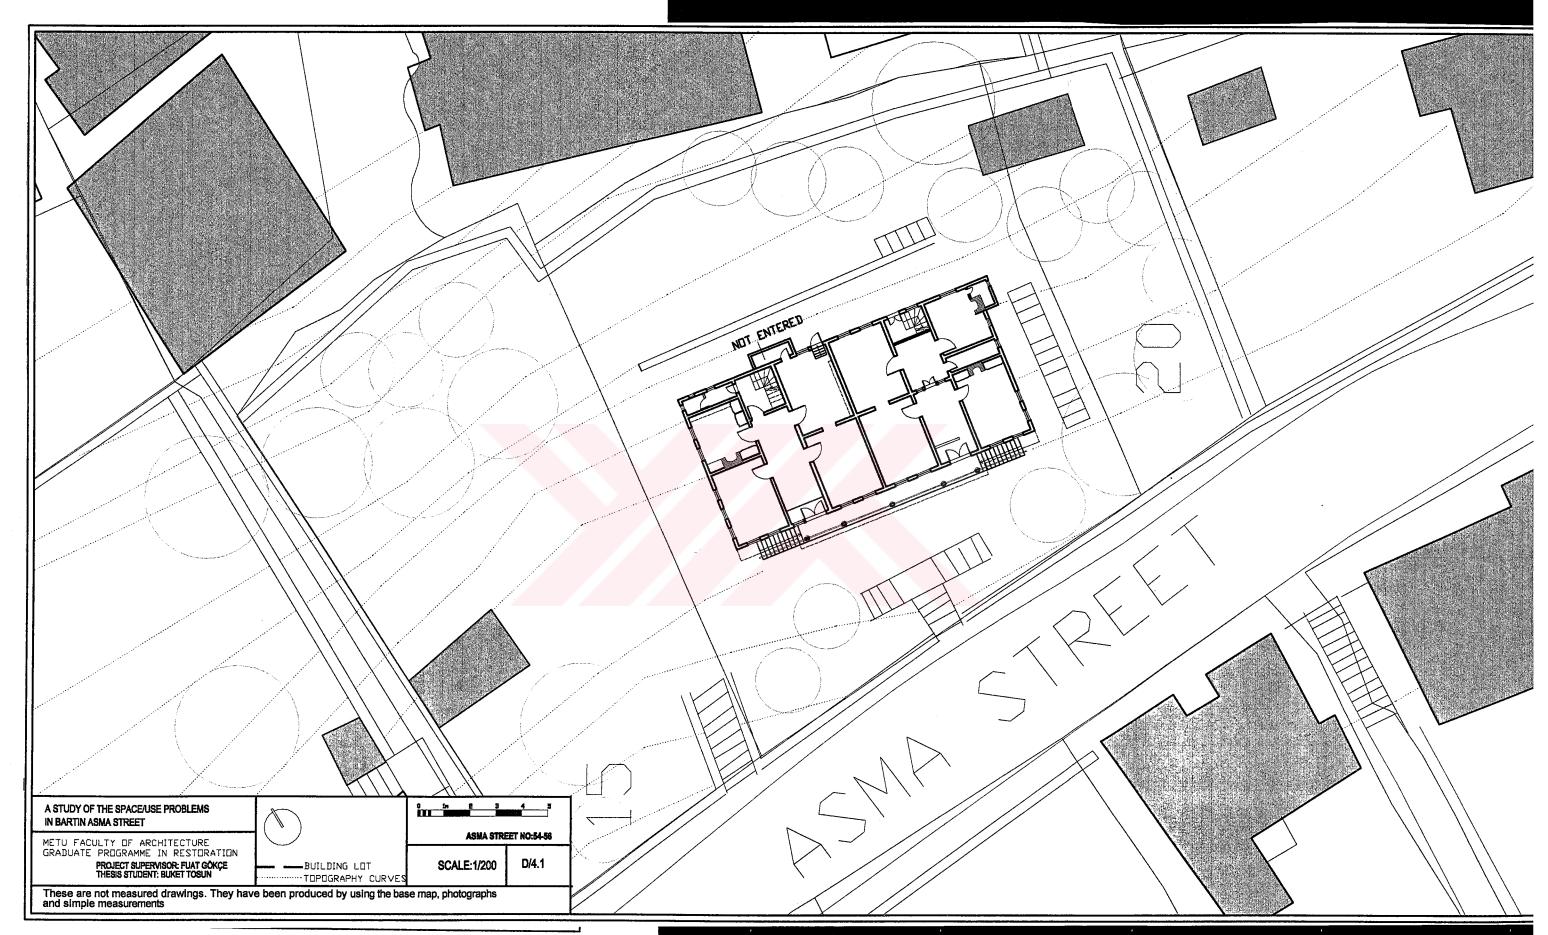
Sketch Drawings of the Building Lot of Building No:54-56
